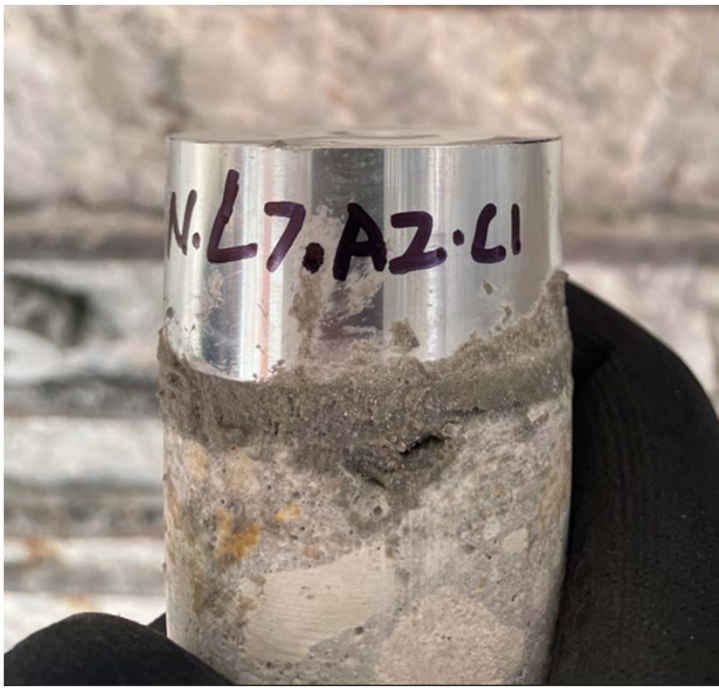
b: Concrete substrate test: Failure Mode S2
